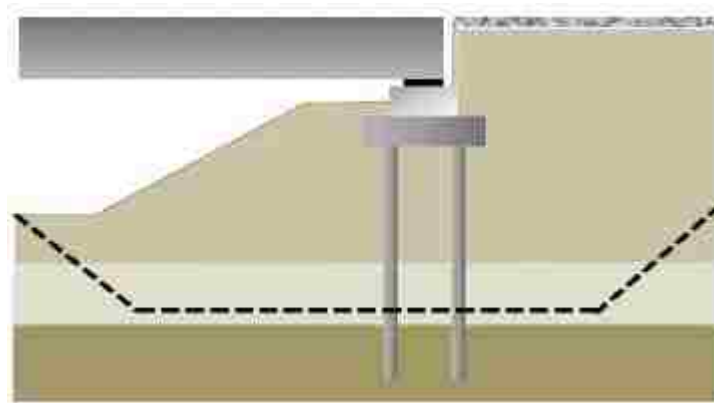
Shear failure surface near bridge abutment (after Caltrans 2013)
